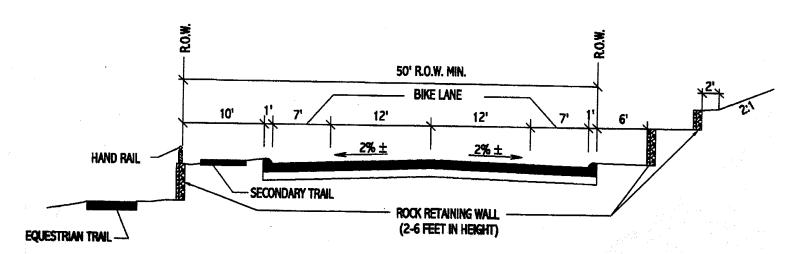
B LOWER RANCH ROAD ADJACENT TO A HILLSIDE
